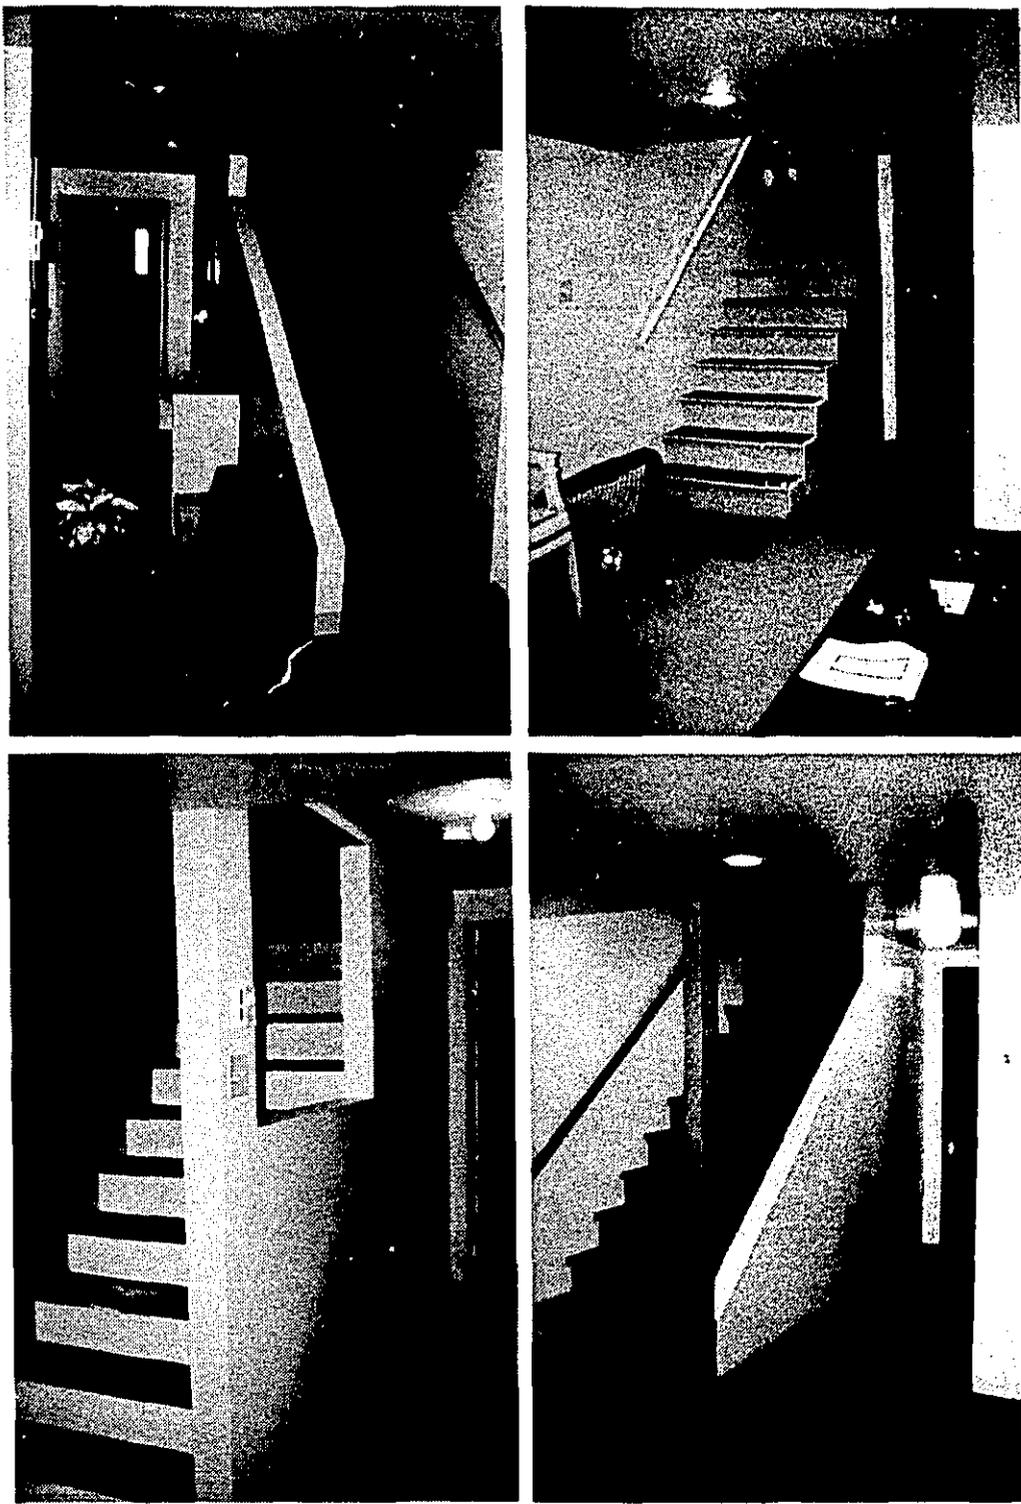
Residents finished and adapted the originally unfinished basement with drywalling work, partitions, floor finishing, ceiling and lighting fixtures. These are examples of openings and of demolishing the wall in the basement stairs to make the room look more spacious.
